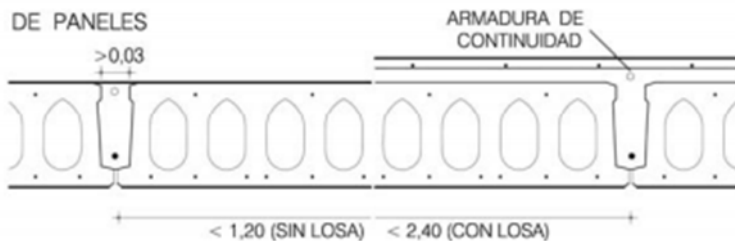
Hollow-core slabs with joint filling and concrete topping.
